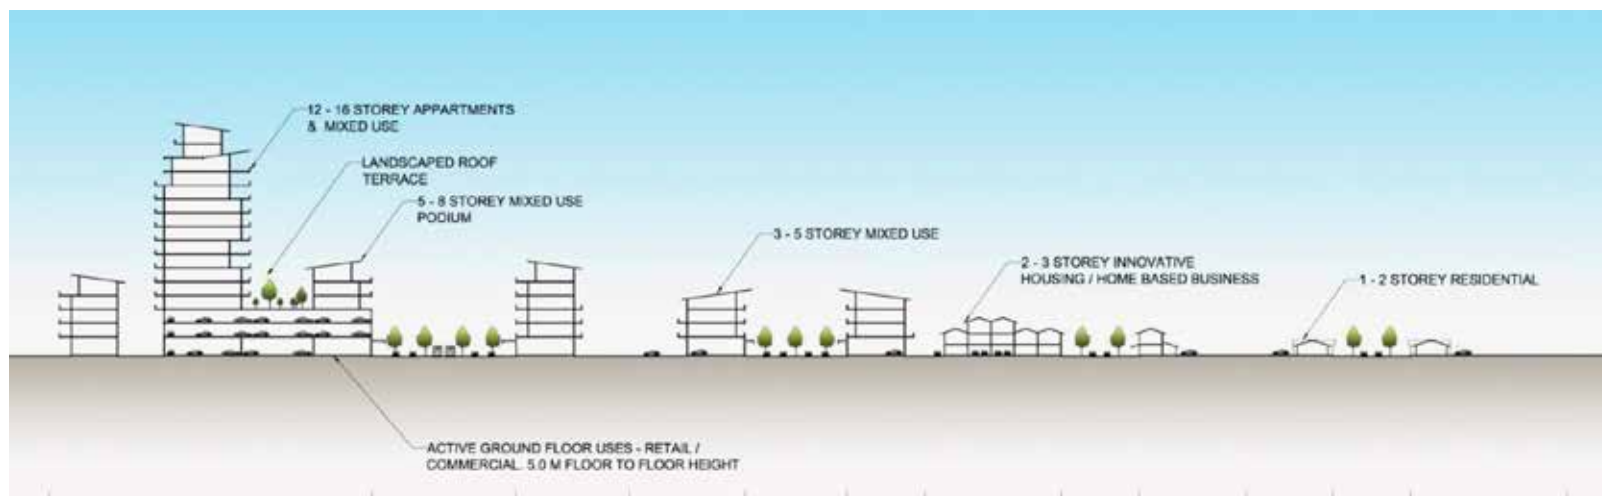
Stepping Down Setbacks to Protect the Amenity of the Street and Adjoining Properties
